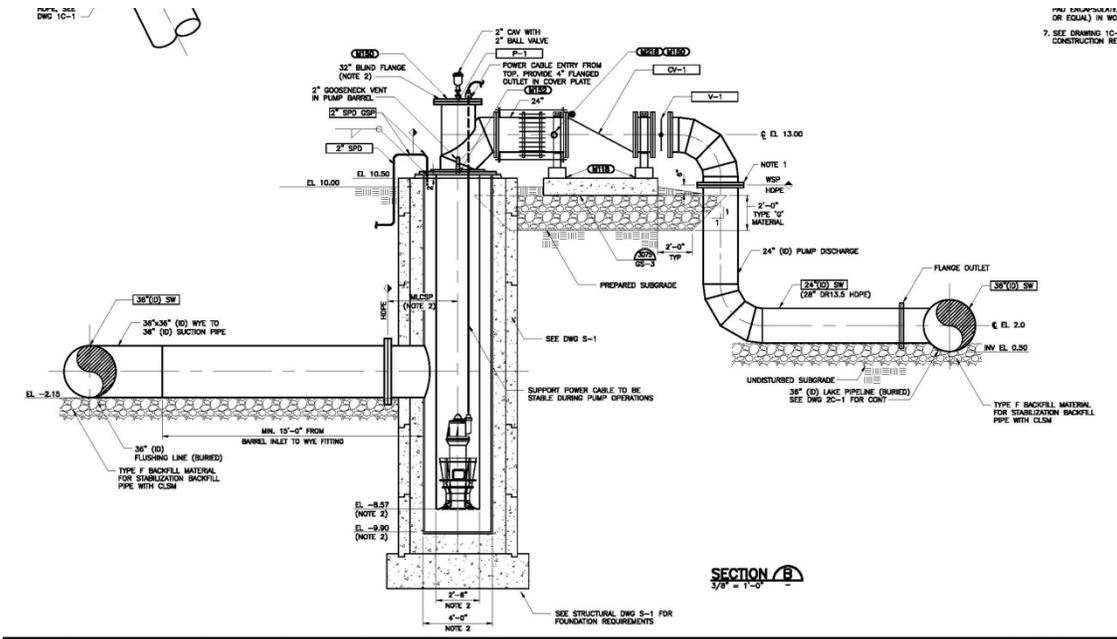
Section drawing of the Sailing Lake Pump Station Wet Well (RMC 2007)
